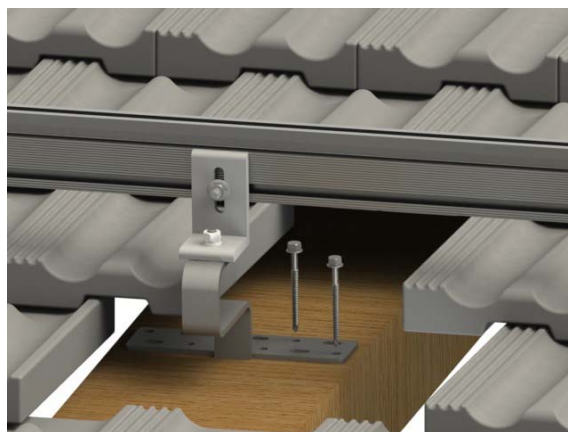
EzQuik Horizontal Tile Hook (MSTSS-S)
